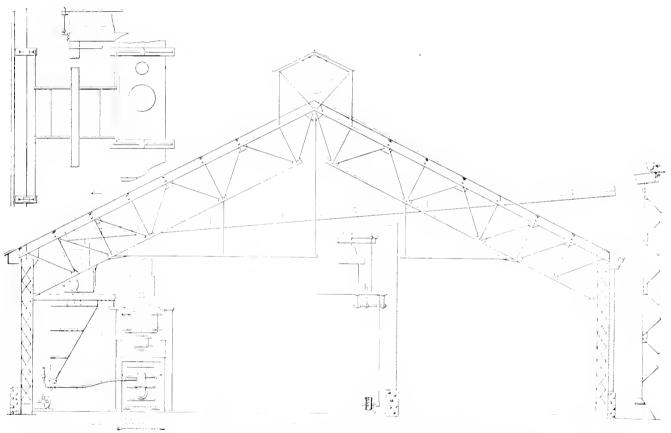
Cross-Section of Hammer Shop Showing Location of Cross Conveyor, Scale, Powdered Coal Hopfer and Three-Door Hammer Furnace
